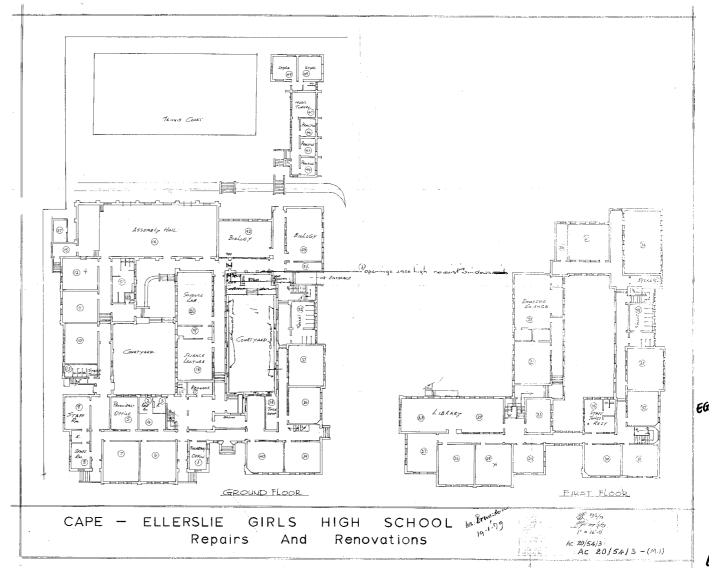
1970s site plan, Cape Provincial Architects Department c.1973 (WCG Archive, 2023)
